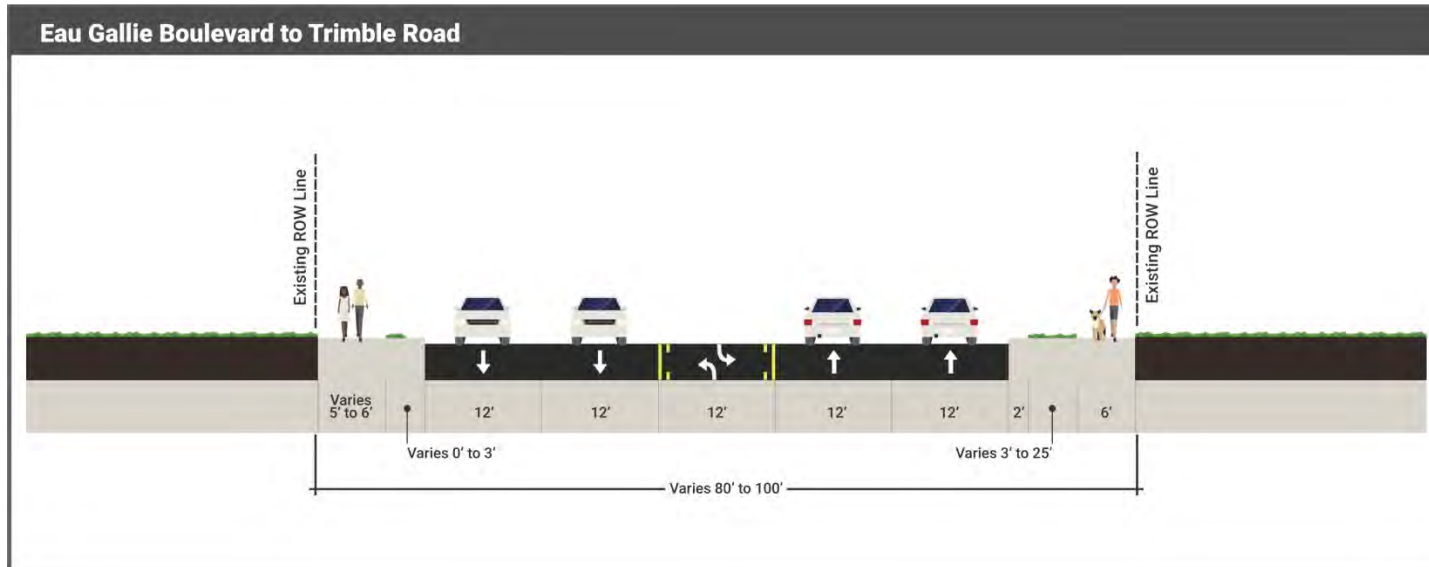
Existing Typical Section – Eau Gallie Boulevard to Trimble Road
